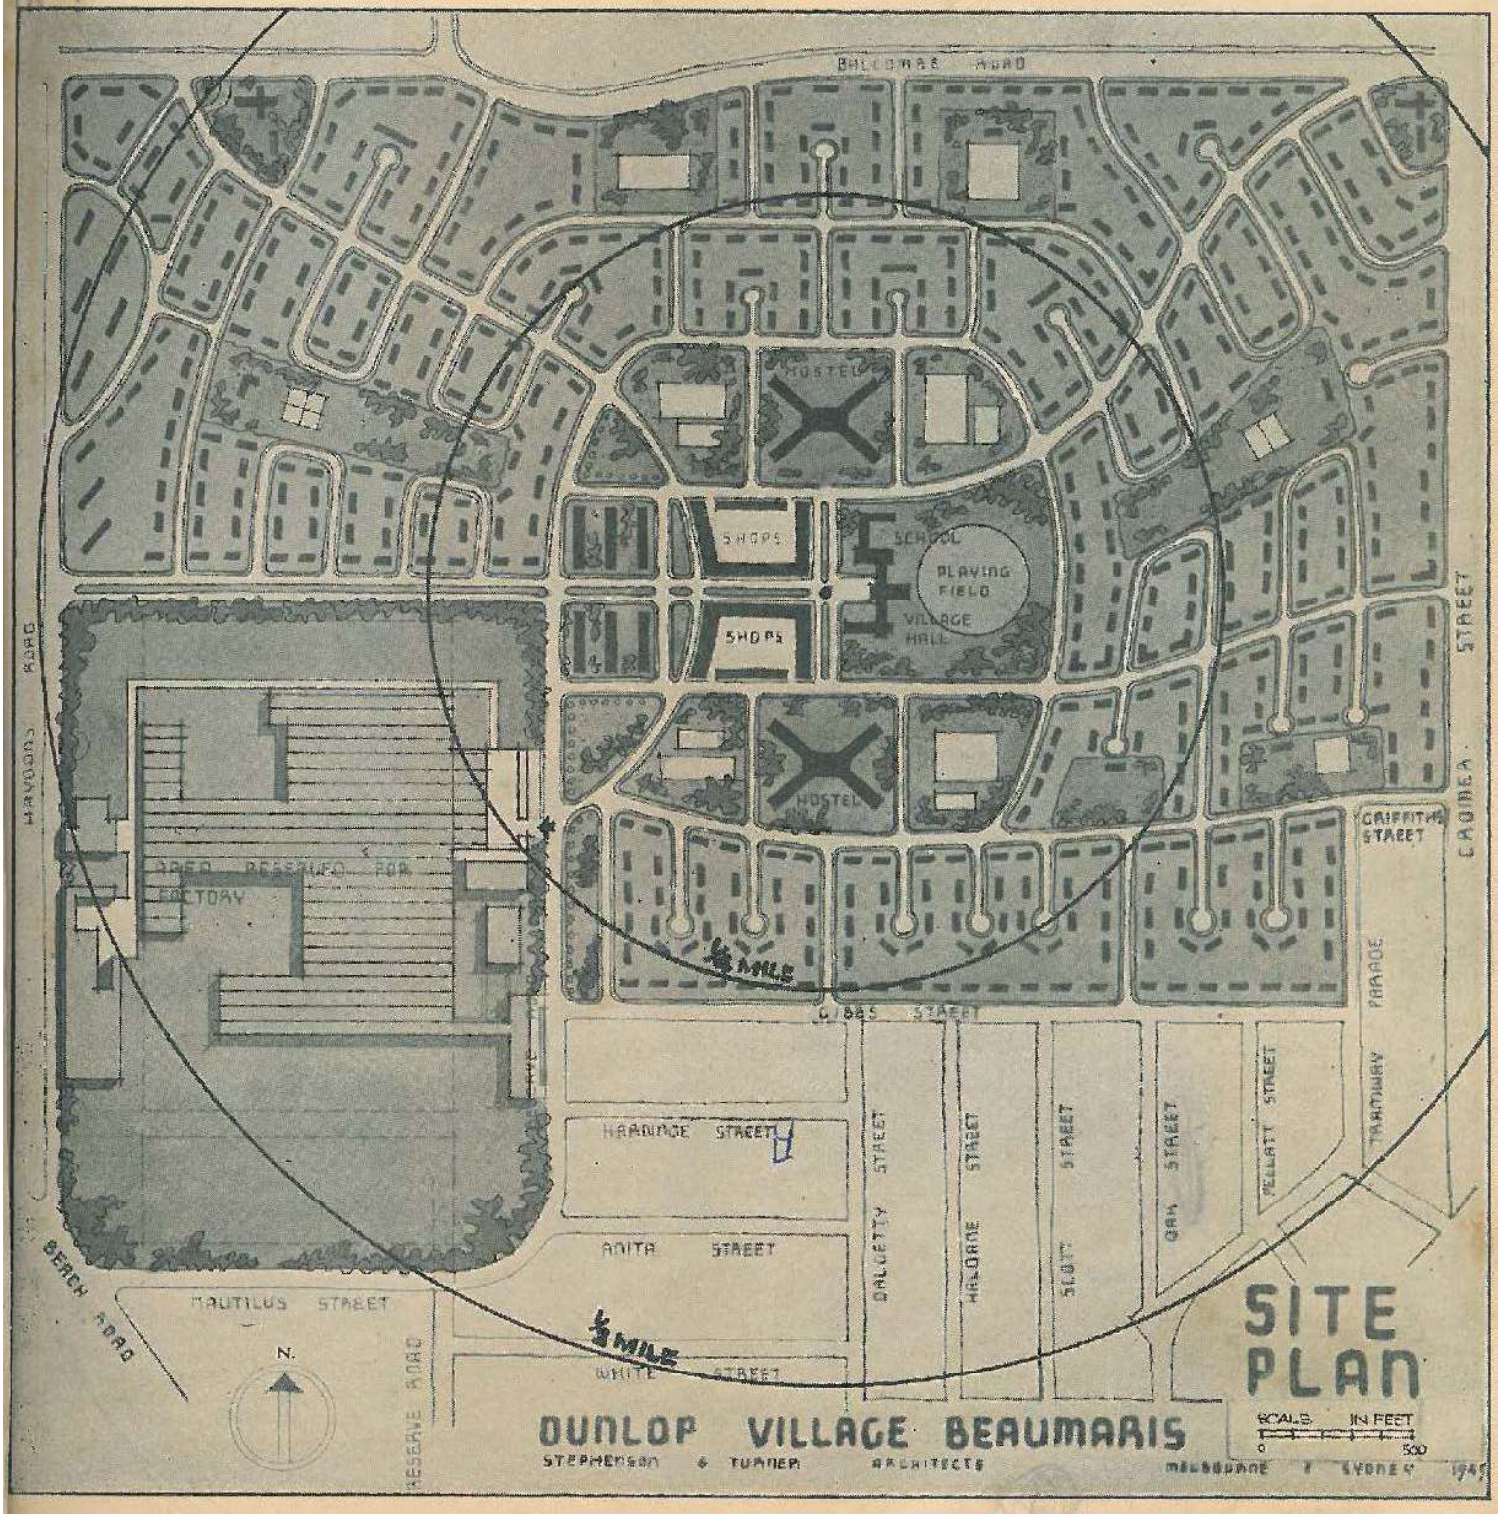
Dunlop Village, Beaumaris site plan designed by architects, Stephenson & Turner, 1945 (Source: Beaumaris Conservation Society).
